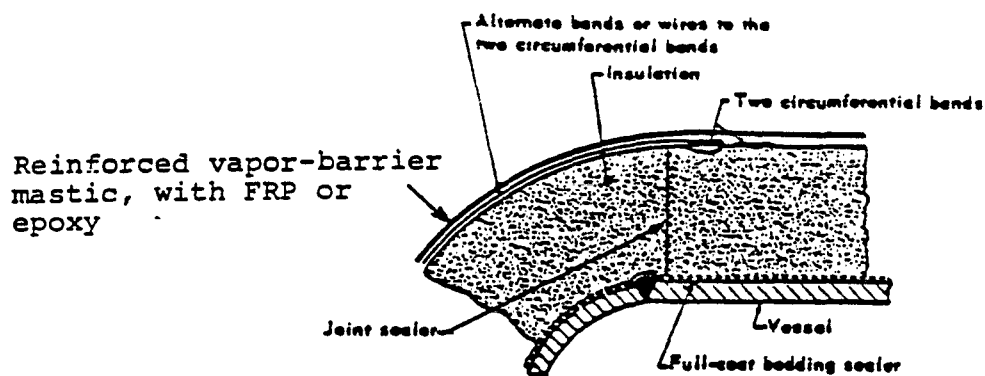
HORIZONTAL CYLINDRICAL EQUIPMENT INSULATION - SINGLE-LAYER
